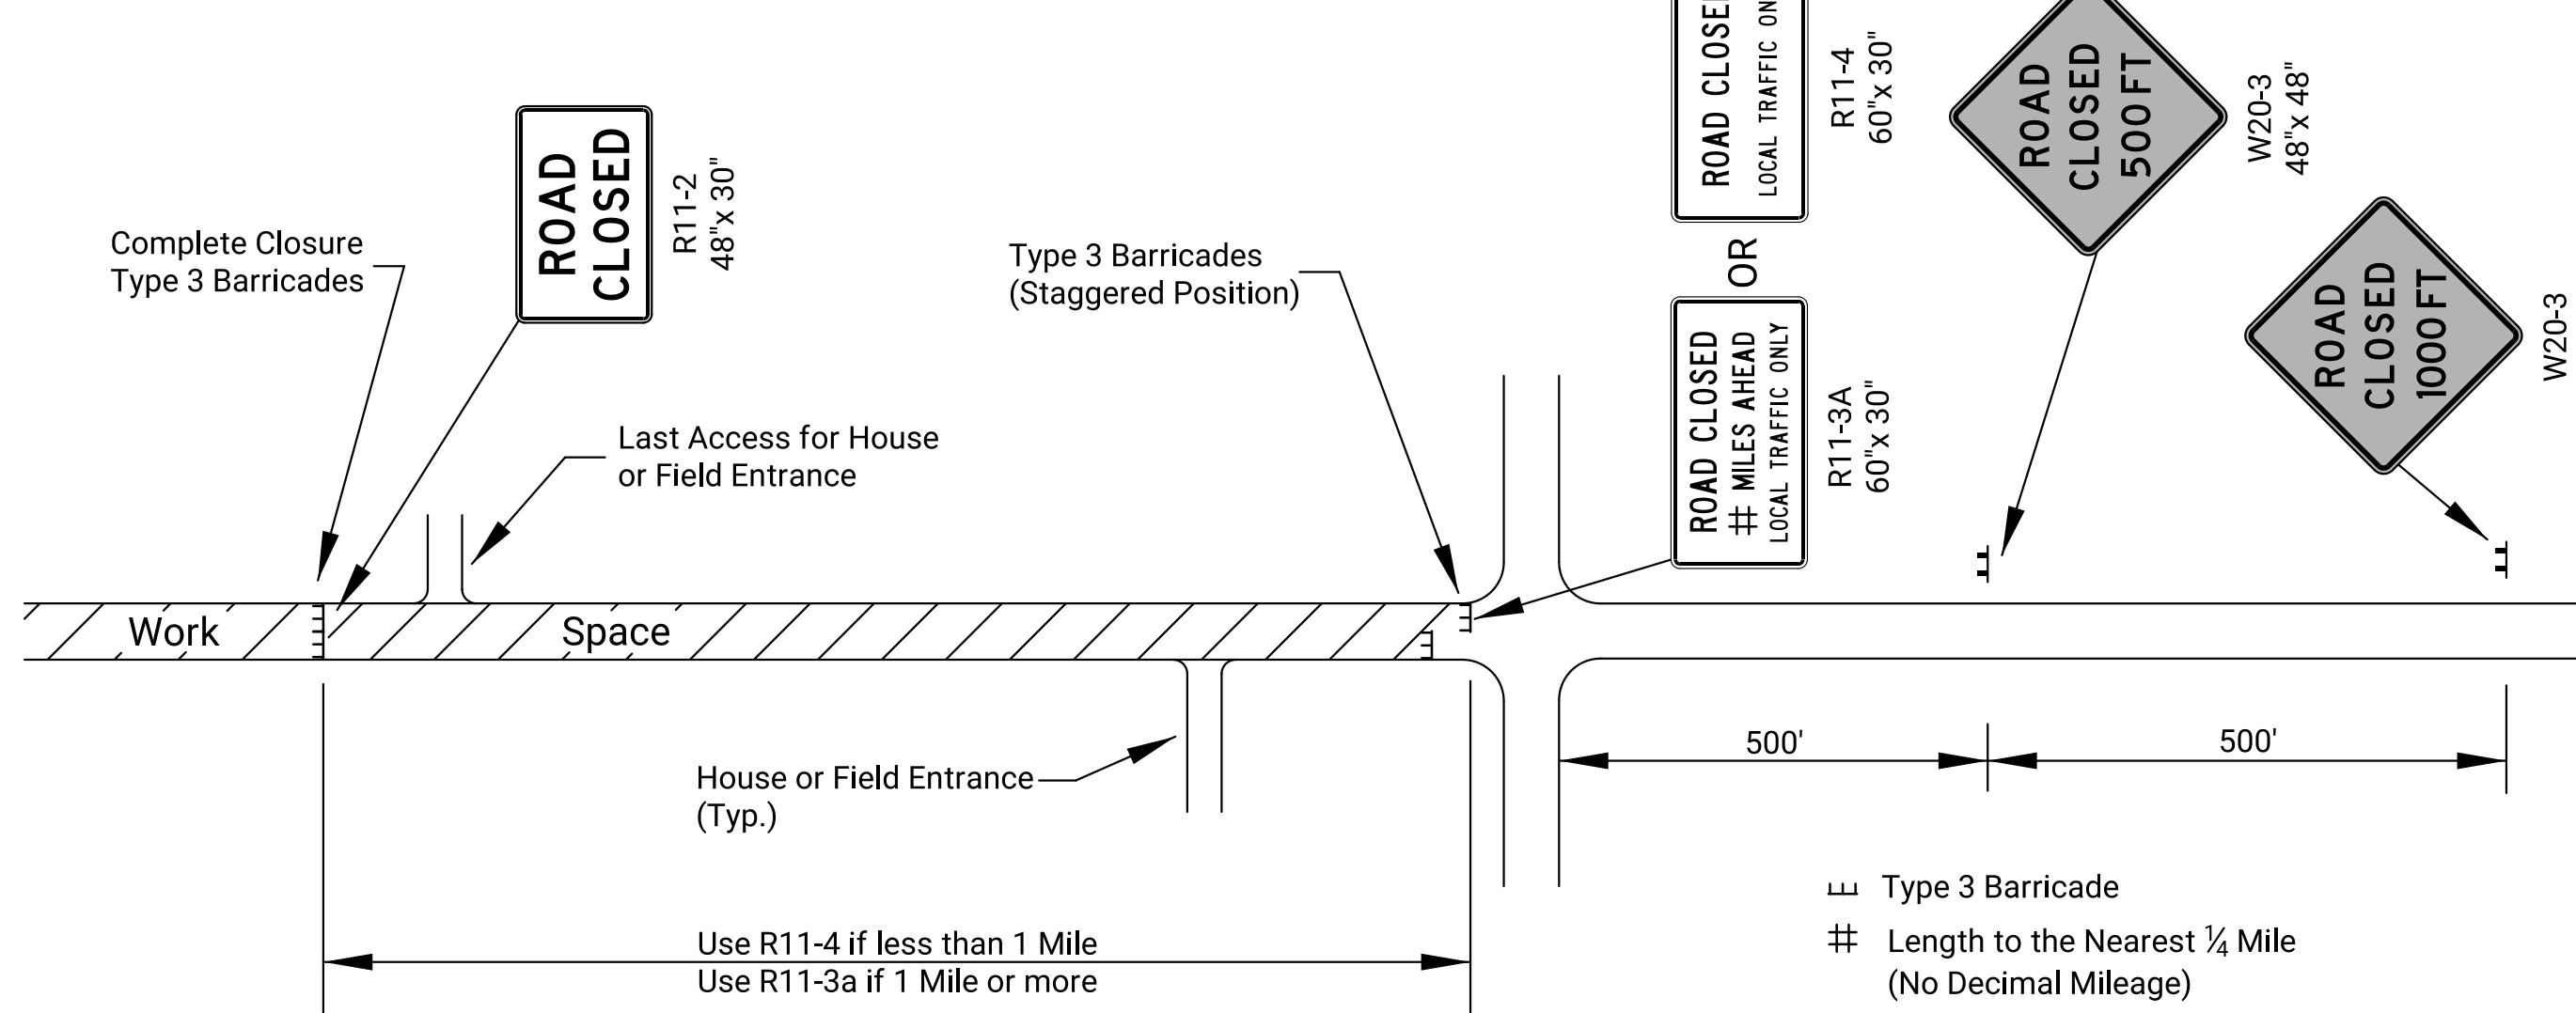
TYPICAL SIGNING FOR ROAD CLOSURE - LOCAL TRAFFIC ACCESS
